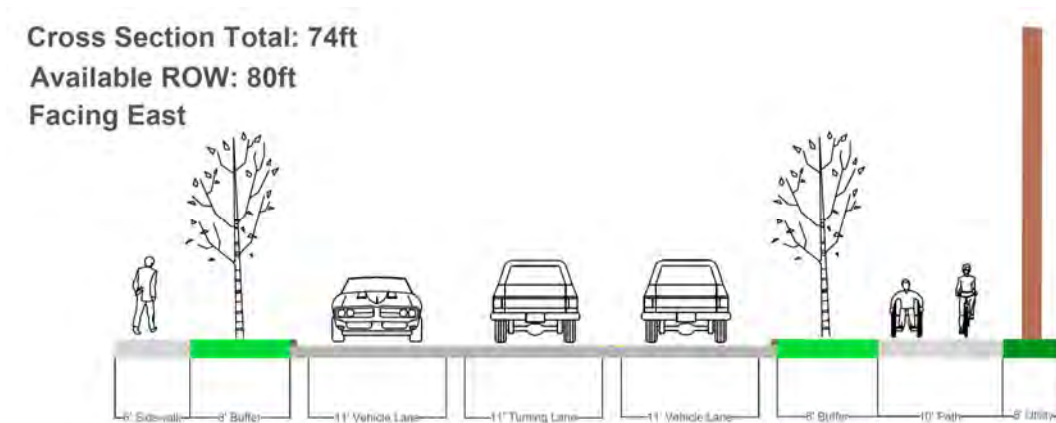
ROUTE 28 CENTERVILLE CROSS-SECTION - OPTION 2F
